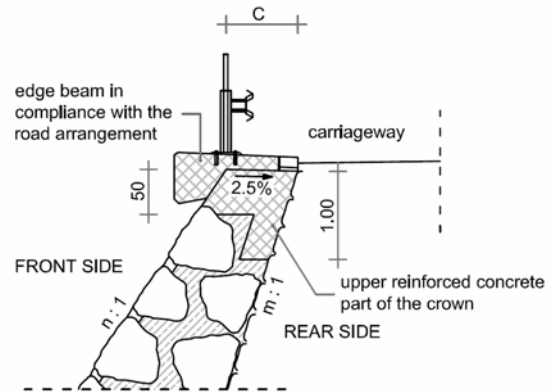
Detail of the crown of a stone gravity supporting wall
